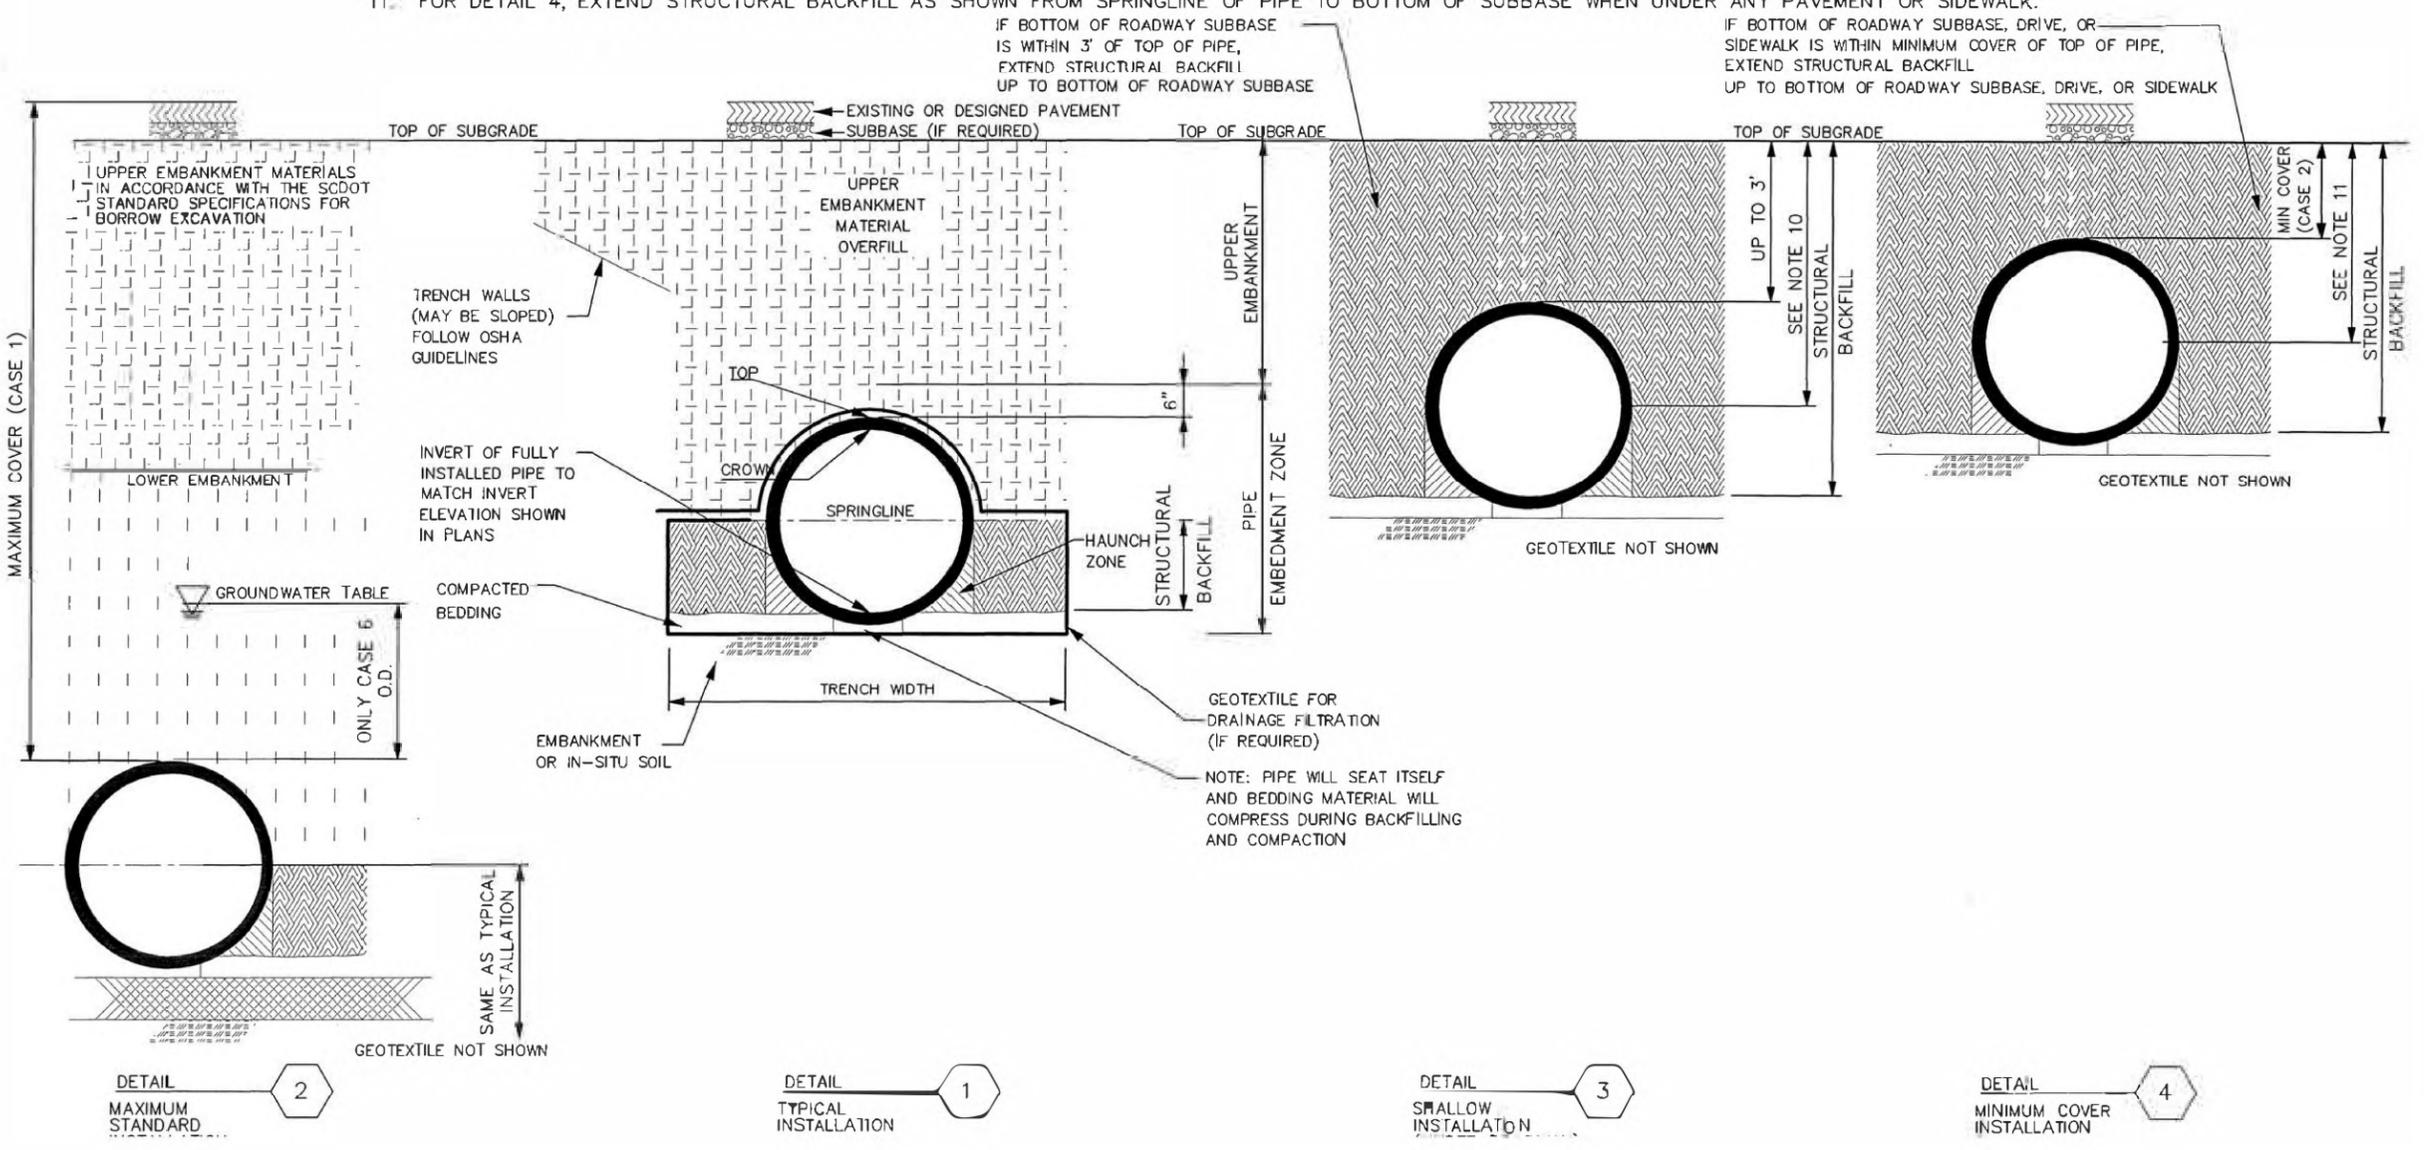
DETAIL BACKFILL INSTALLATION W/ NO IMPROVED FOUNDATION WORK 4
